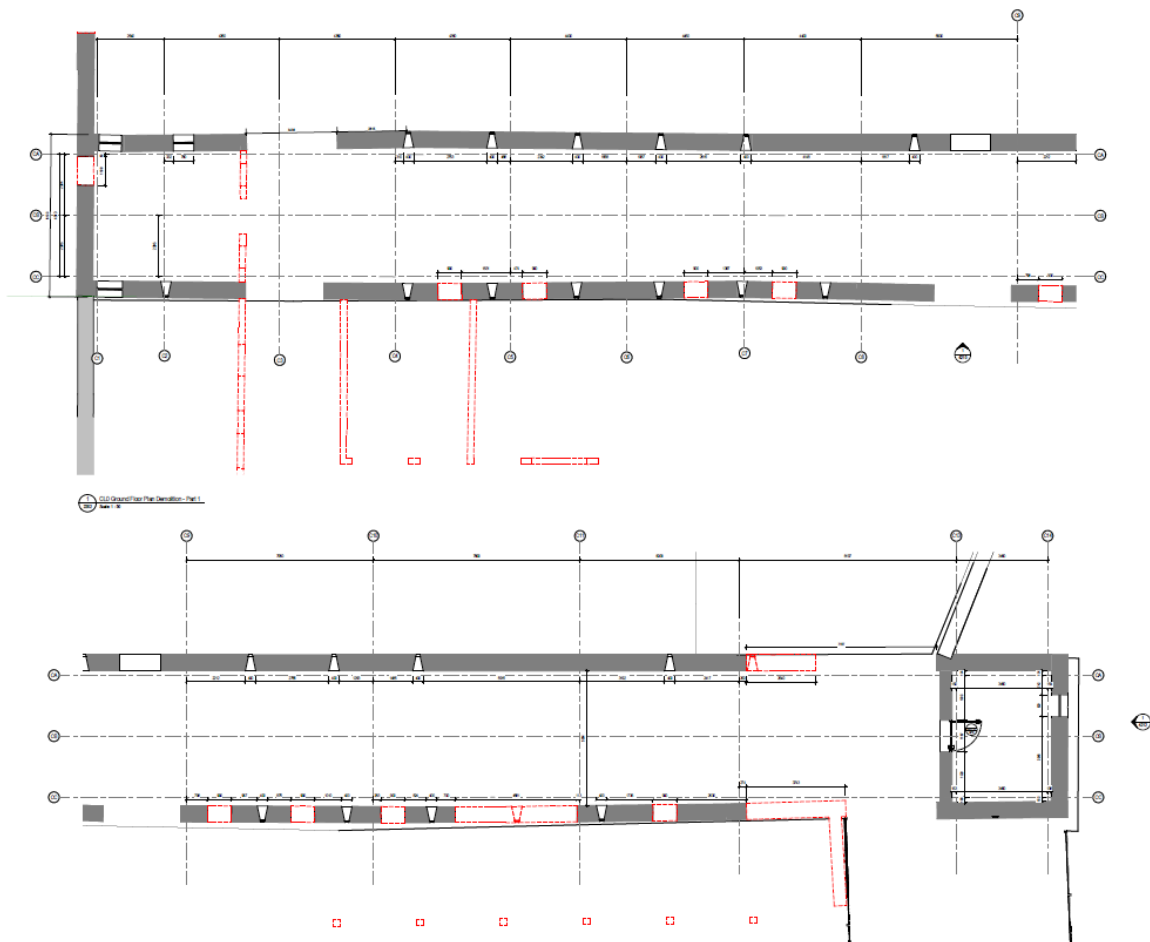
Coach House ground floor demolition plan. Source: TOT Architects. Top: western section. Bottom: eastern section
